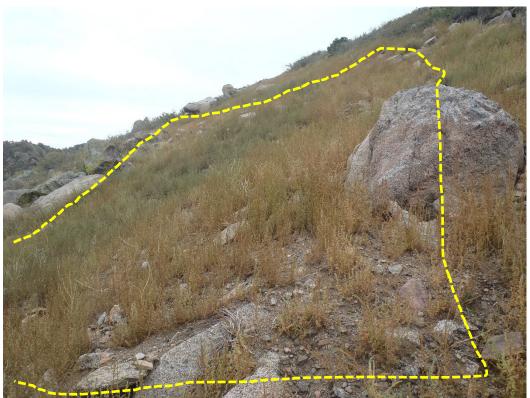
Backfilled Windy Point access Road C.1 (looking SE from approx. BLM boundary line, Note R. thistle).
